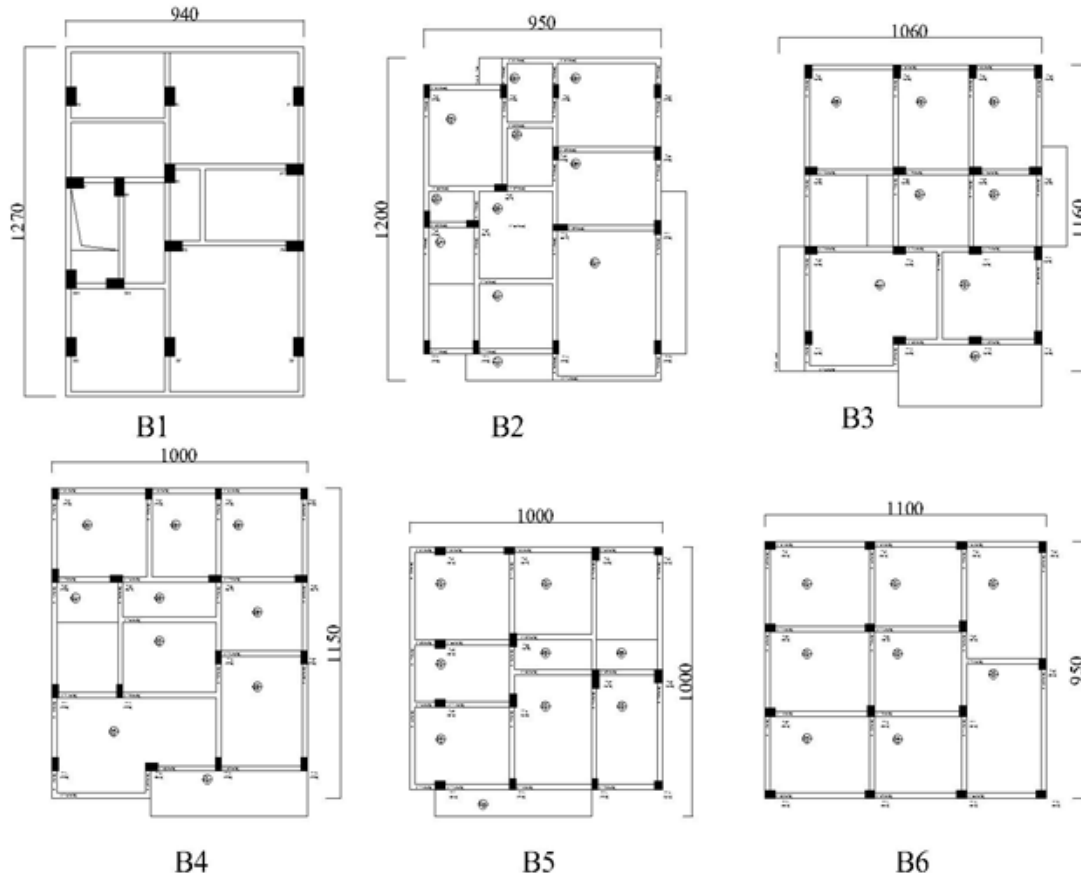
Existing buildings typical floor plans (adopted from Ozcelik, 2014) (dimensions are in cm)
